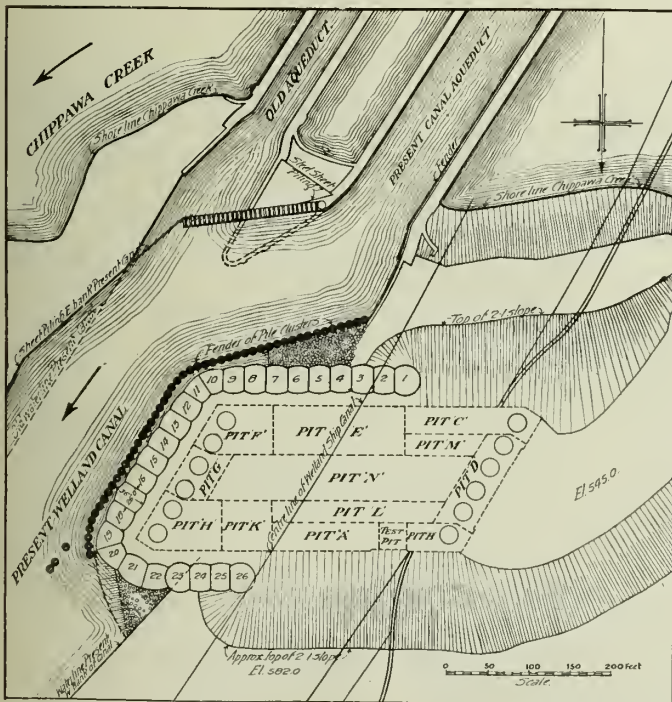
Plan showing Present Canal, Chippawa Creek and Excavation Pits for New Syphon.
